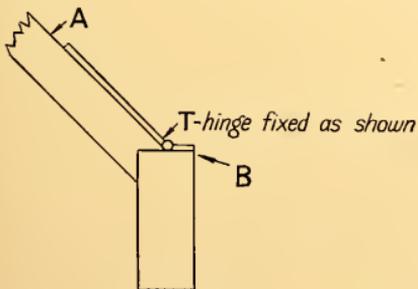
PRINCIPLE OF TRAP DOORS AND BREAKING JOINT
